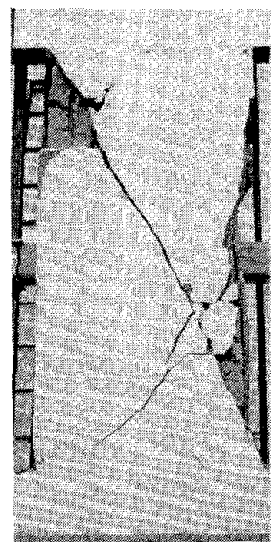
SUCCESSIVE CRACK FORMATION TEST 2. (RIGHT SIDE PIER)
